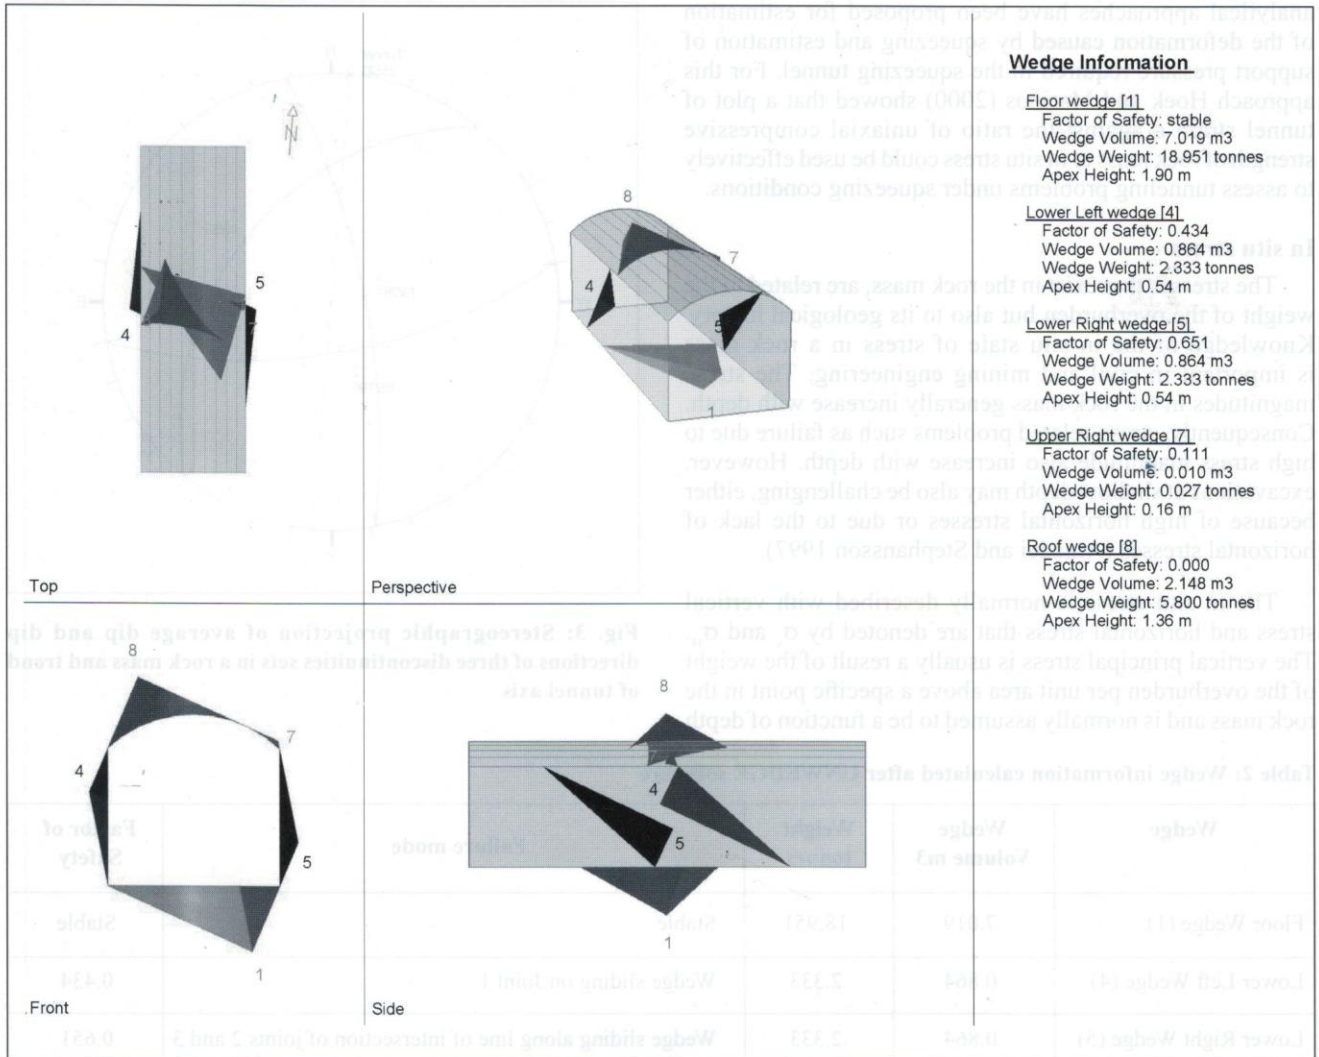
Wedge formed in the roof, floor, and side walls of proposed headrace tunnel
